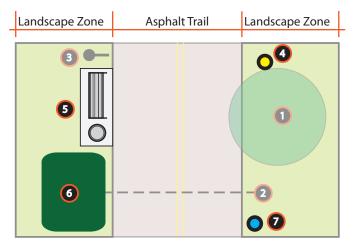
Belt Line Greenway Plan-Section: Full Level of Development
